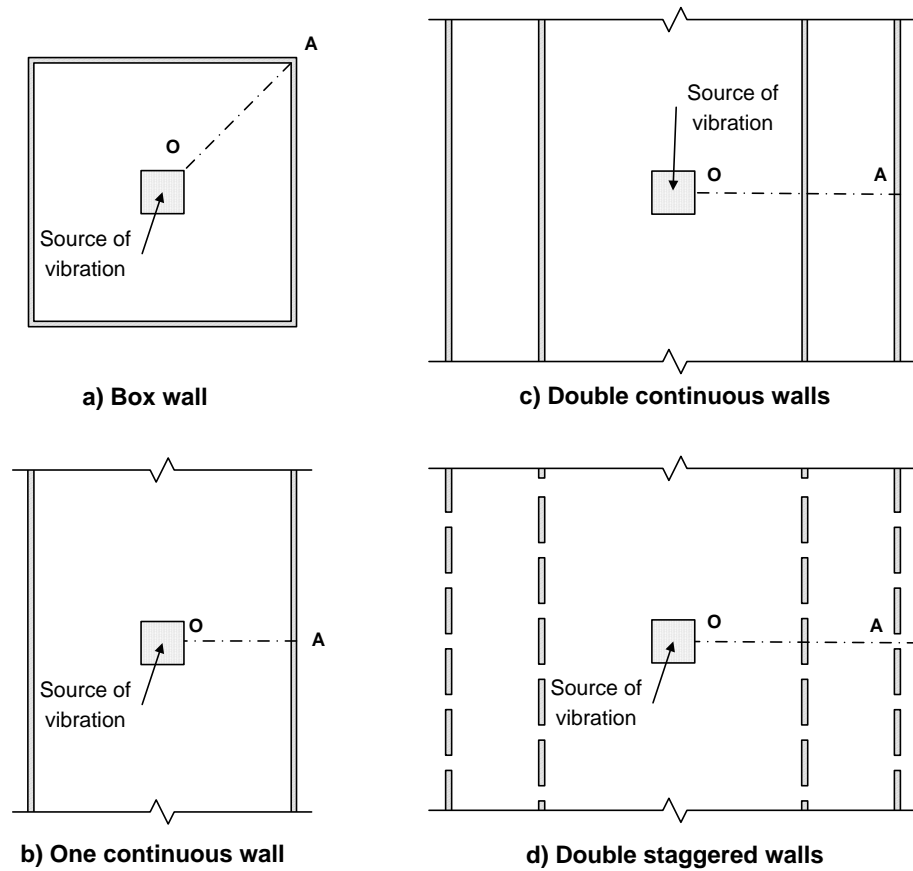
7: Plan views of in-filled geofom trench isolation systems
